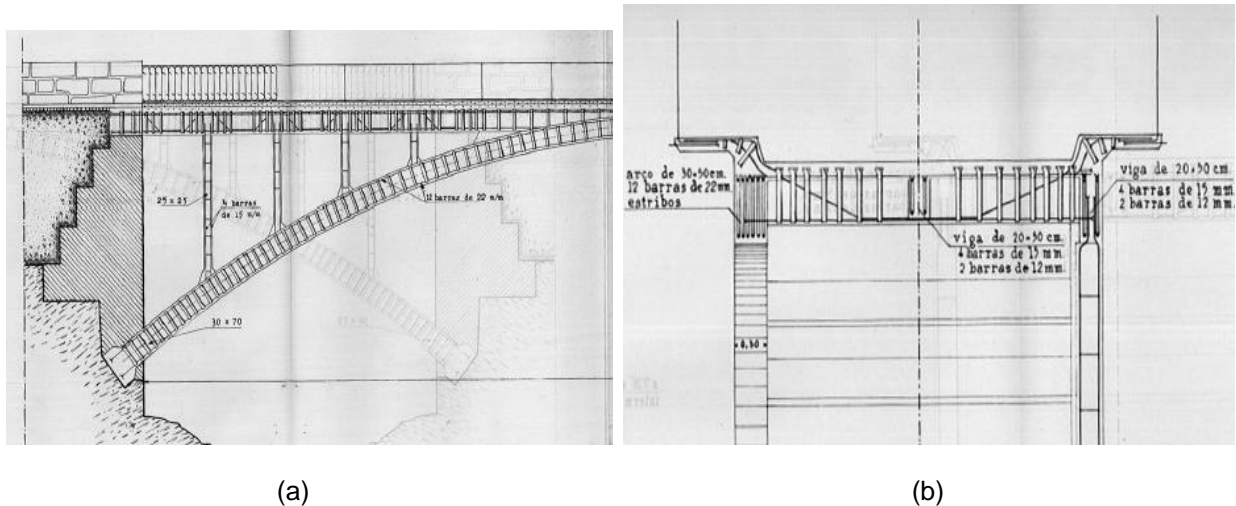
Original geometry and steel reinforcement : (a) downstream elevation (b) cross-section of the deck [35]
